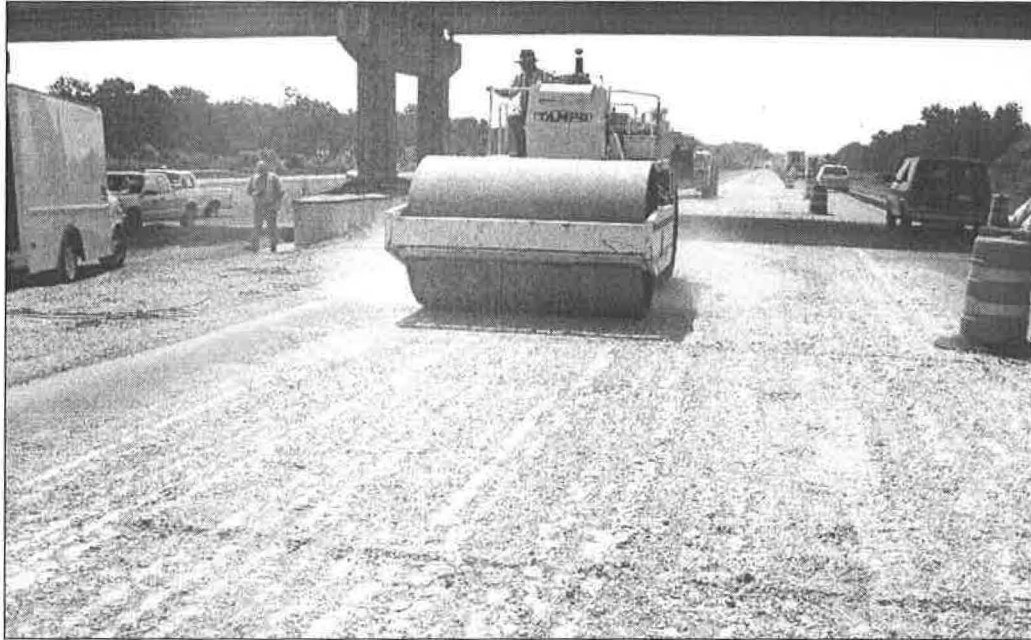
Seating the Pavement (photo by Kevin D. Hall, University of Arkansas).
